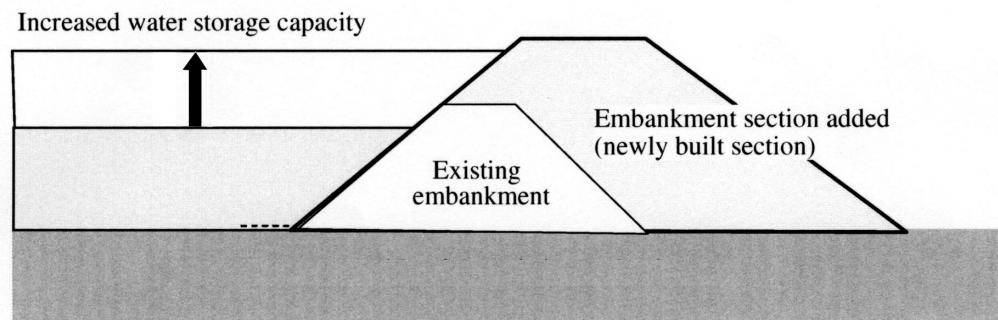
Application of the breaking and roll compacting banking method (to raise a earth dam)
